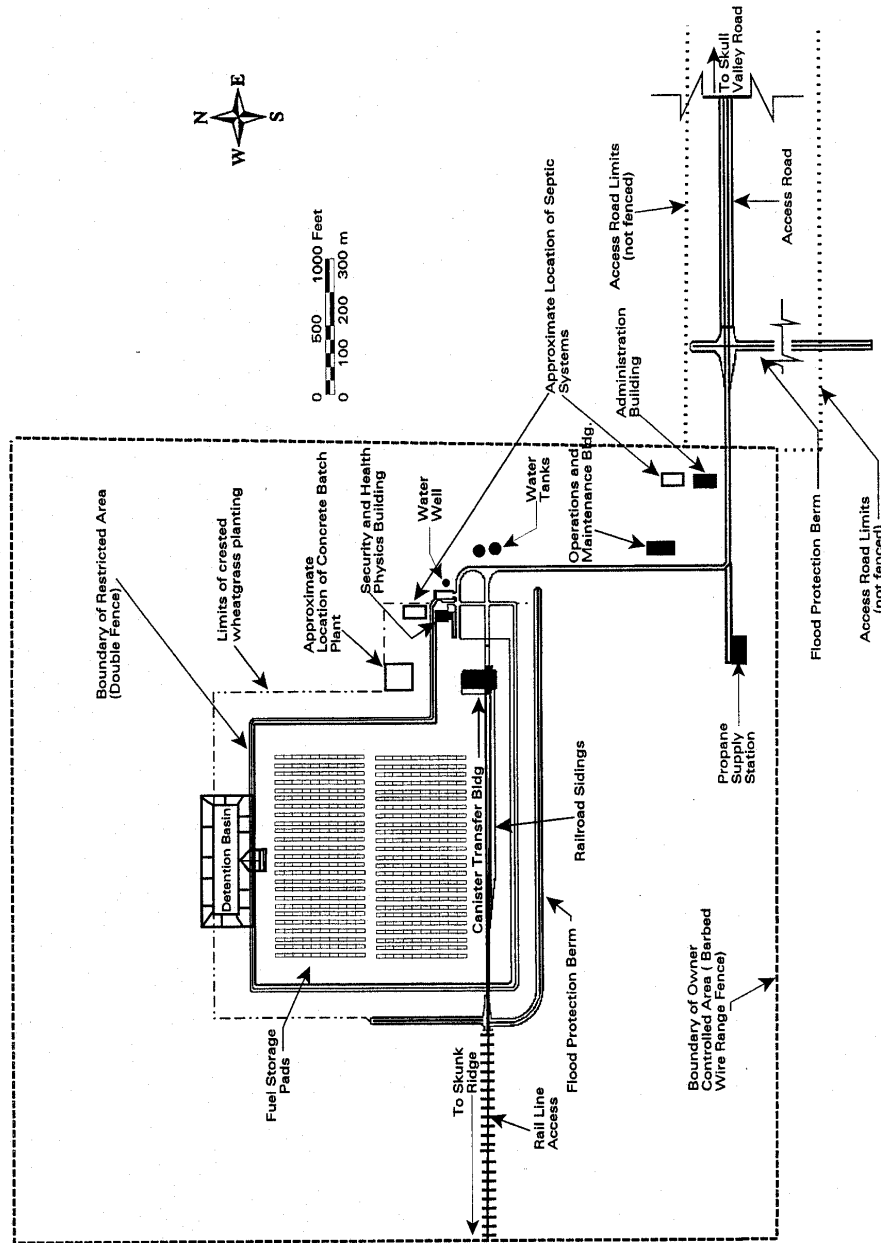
Basic site plan and layout of structures and facilities at the proposed PFSF.
